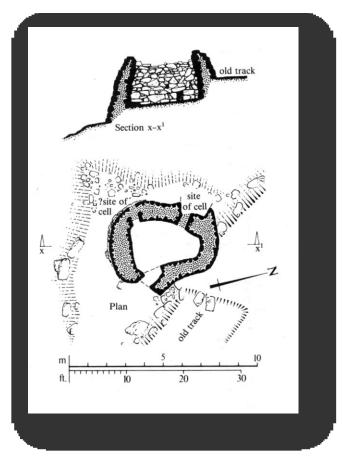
Plan and sectional elevation of Structure 32 (RCAHMS 1988, 43). Inked drawing DC 10802 © RCAHMS
